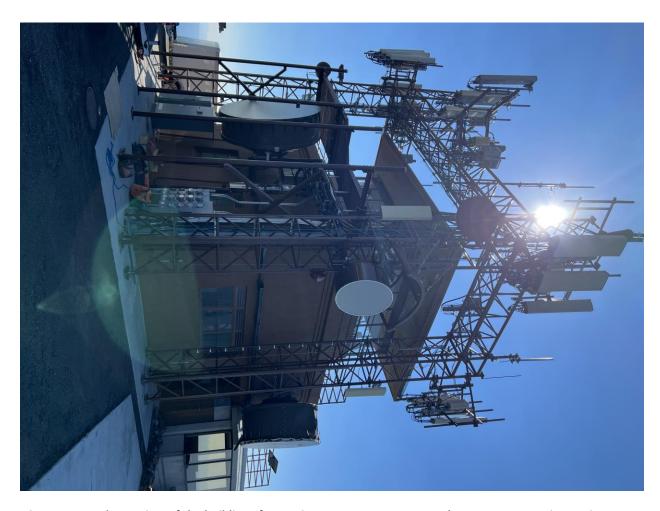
Northeast view of the building after Verizon antenna structure and concrete restoration project were complete.
